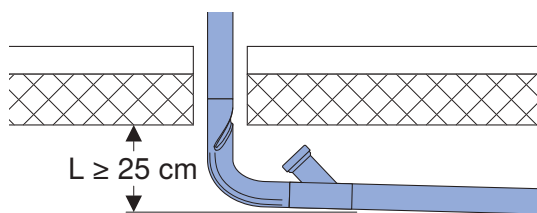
Distance of stack offset from the ceiling when installing a Geberit HDPE access pipe 45°
